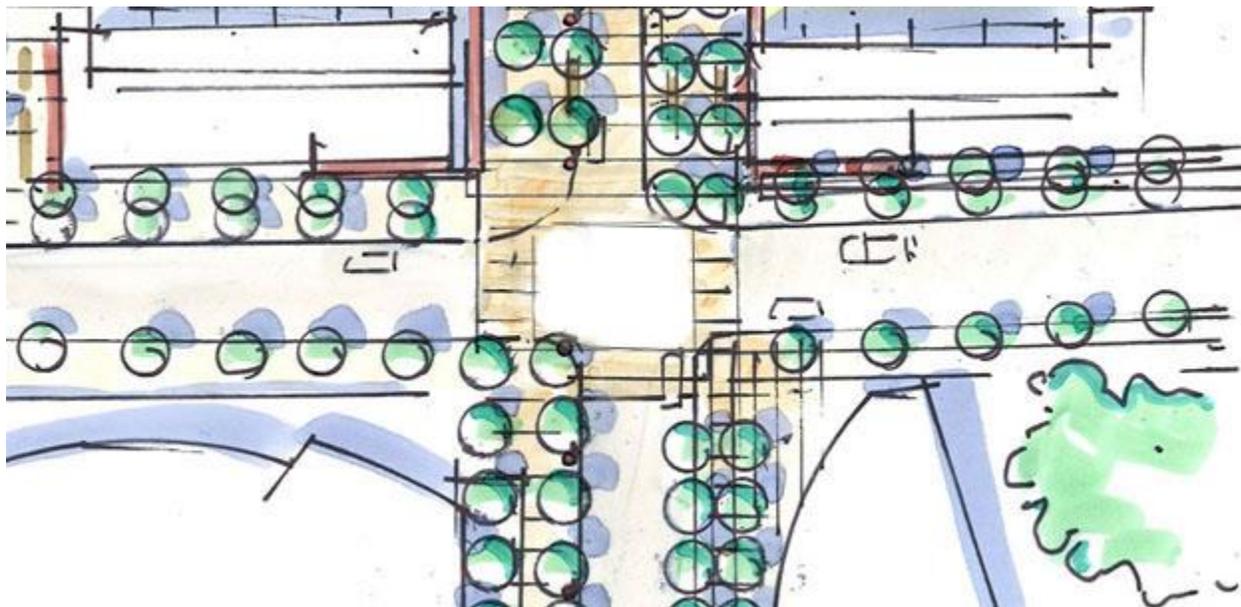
Plan View of Intersection at King Road and University Way North / Cascades Plaza
